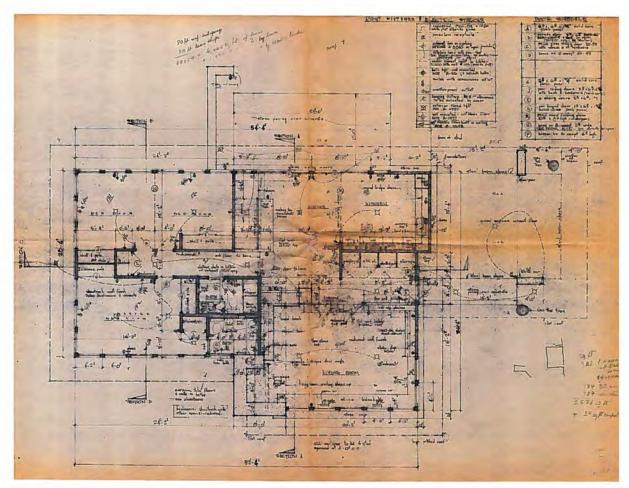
Blueprint for the Hammond House, first floor layout, ca. 1962.
